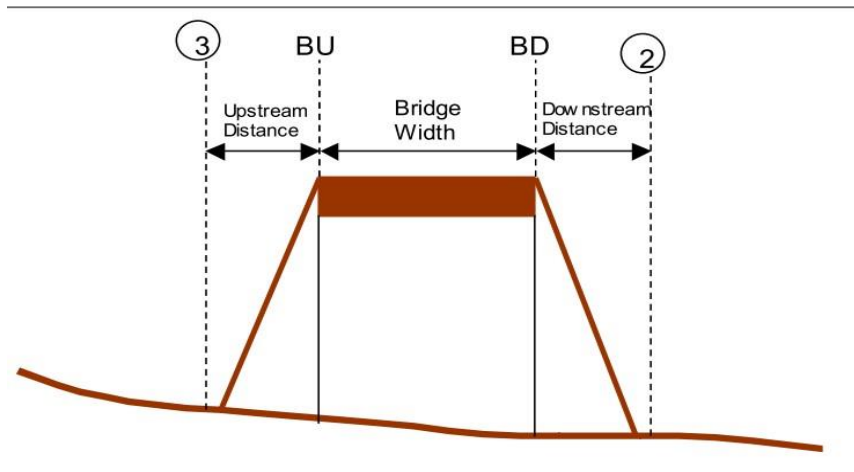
Example Bridge Profile with Upstream Distance, Bridge Width, and Downstream Distance(Gary W. Brunner n.d.)
